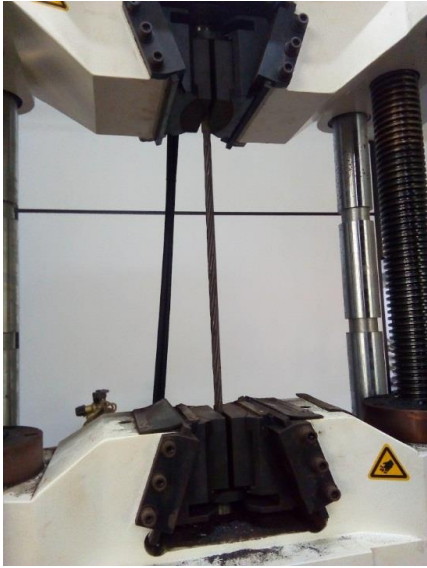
Universal testing machine with prestressing strand sample inserted
